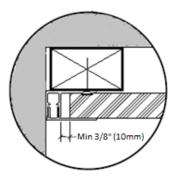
, Plan detail of SAGIWALL perimeter trim (J-Mold Trim)
